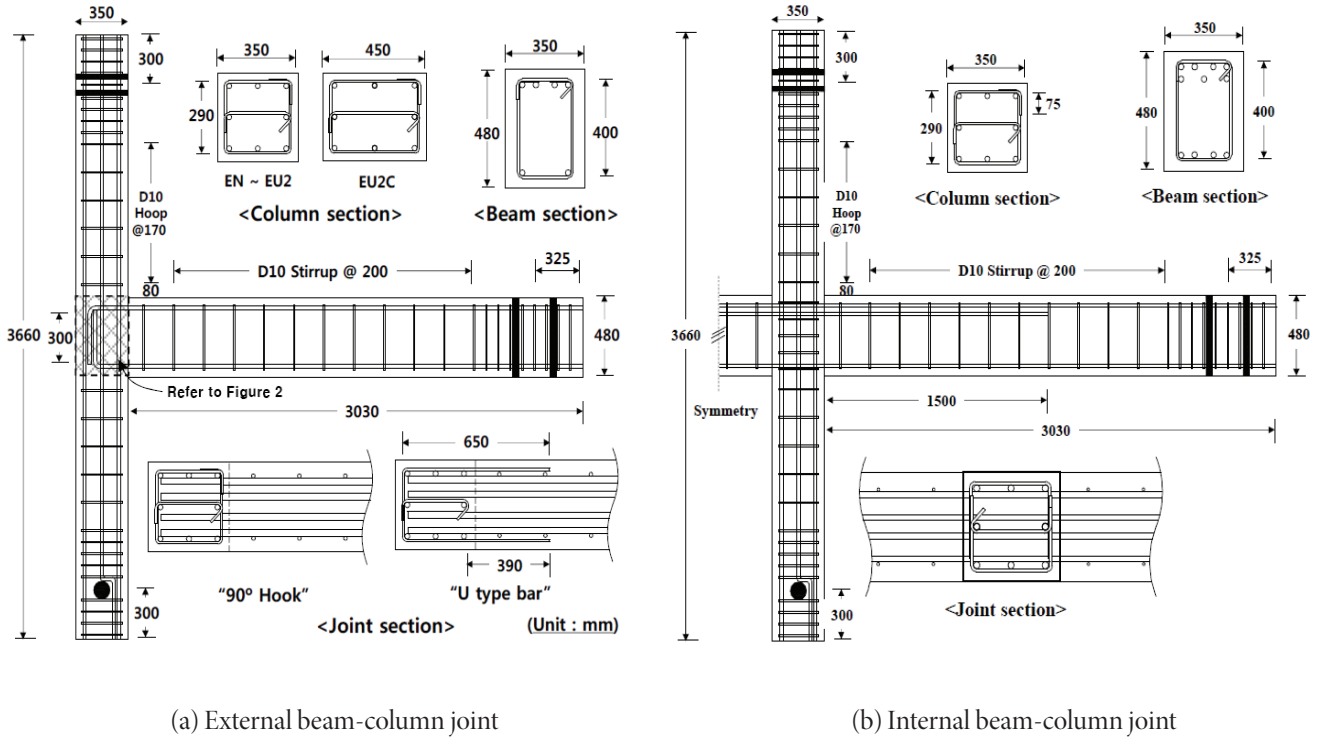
Dimensions and reinforcement details of beam-column joint specimens (Kim et al., 2016a)
